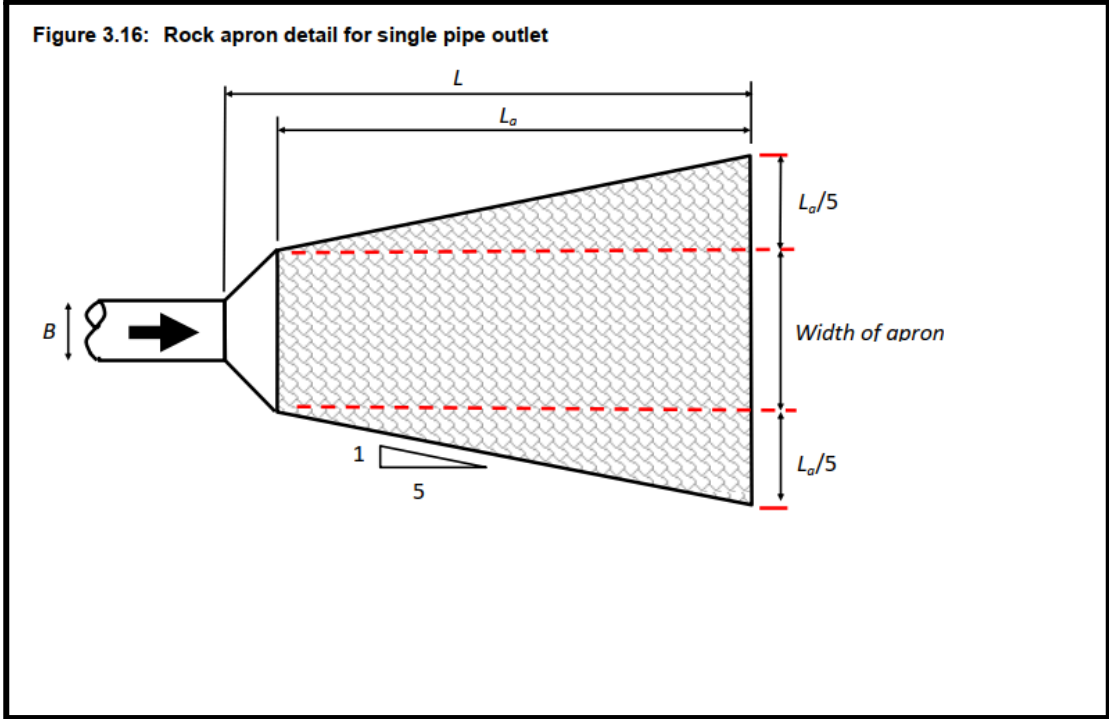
Figure 3.16 - Rock apron detail for single pipe outlet.
